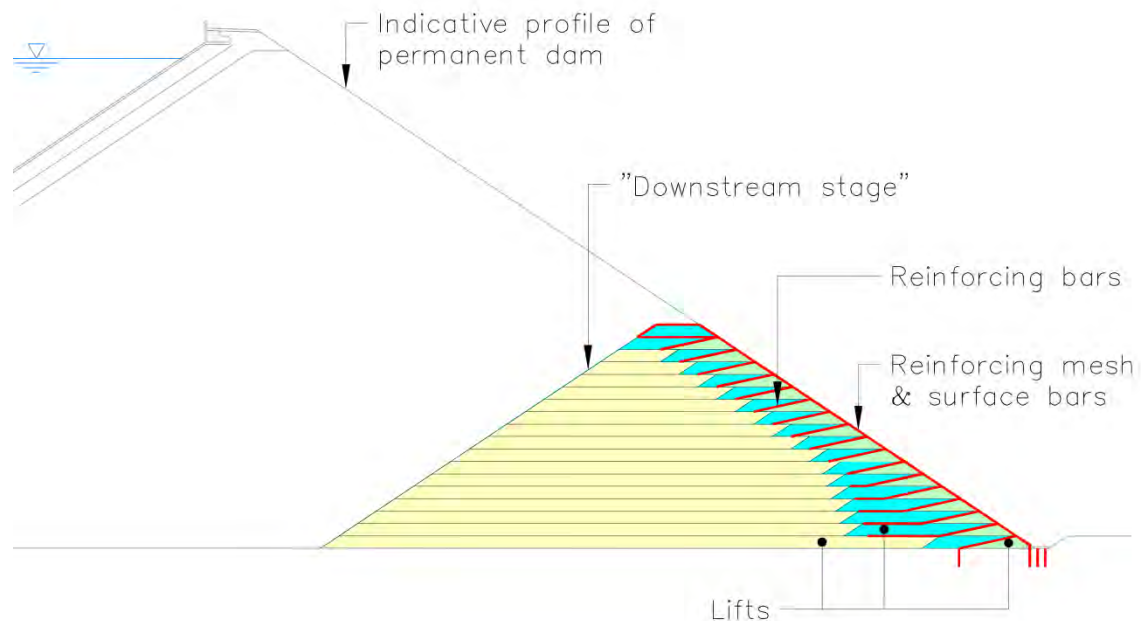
Indicative arrangement for reinforced "Downstream stage" of dam construction
